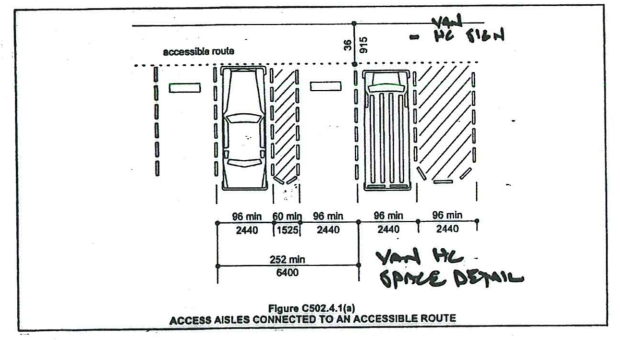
(p) ACCESS AISLES CONNECTED TO AN ACCESSIBLE ROUTE
